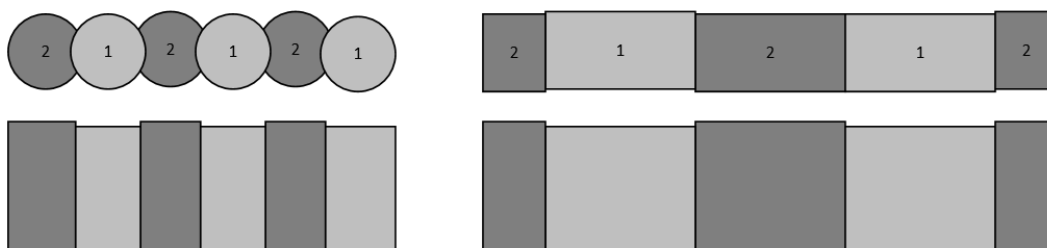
Retaining walls of foundation piles (left) and diaphragm walls (right)
